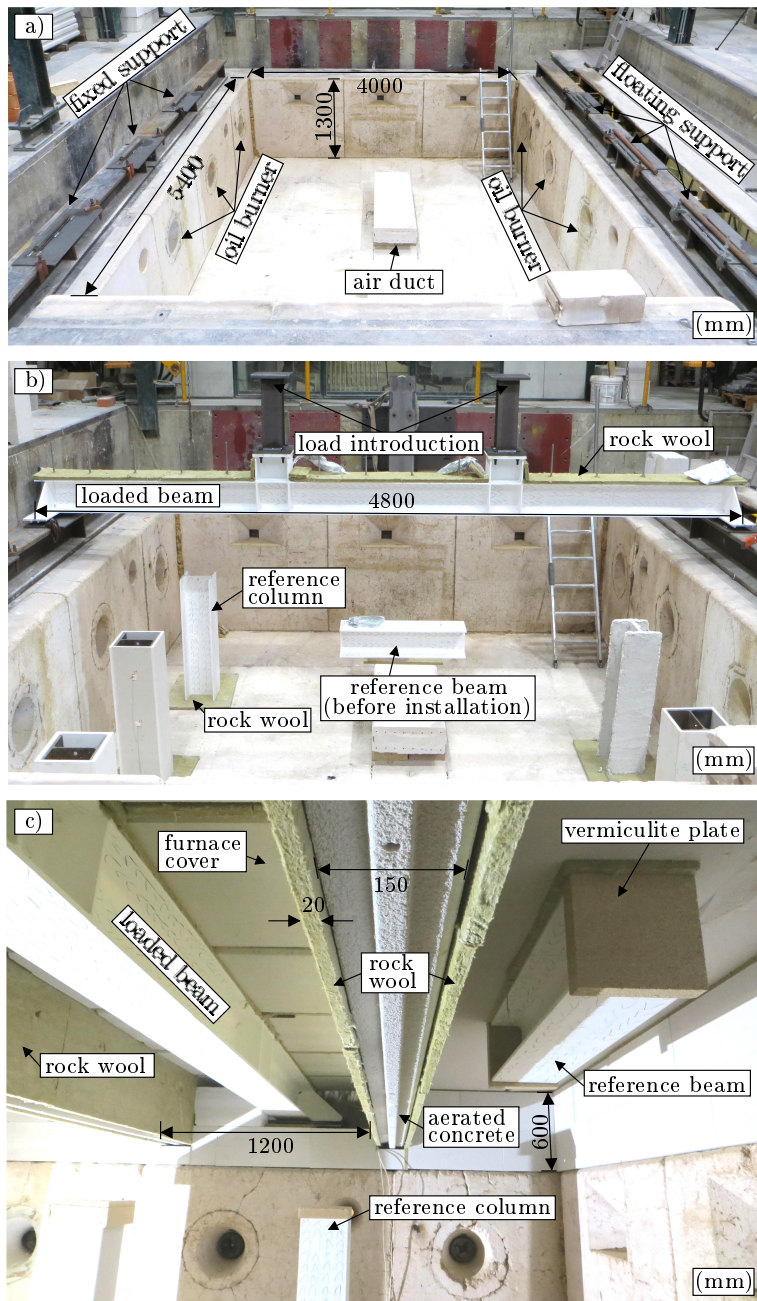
Test setup of the large-scale fire test: a) dimensions of the furnace and arrangement of the supports, b) positions of the loaded beam and reference column and c) orientation of all three test specimens inside the furnace
